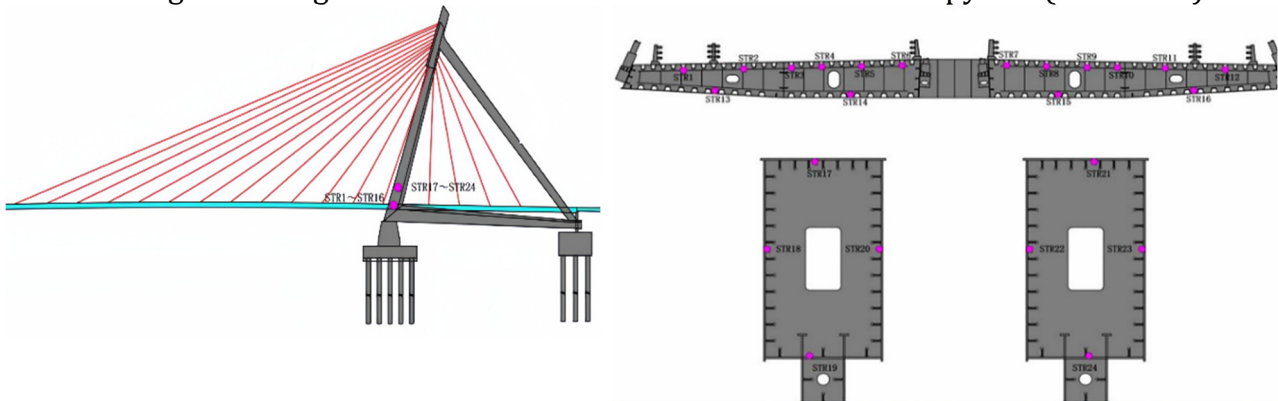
Sensor Layout of Bridge Inspection System for Ningbo Waitan Bridge
